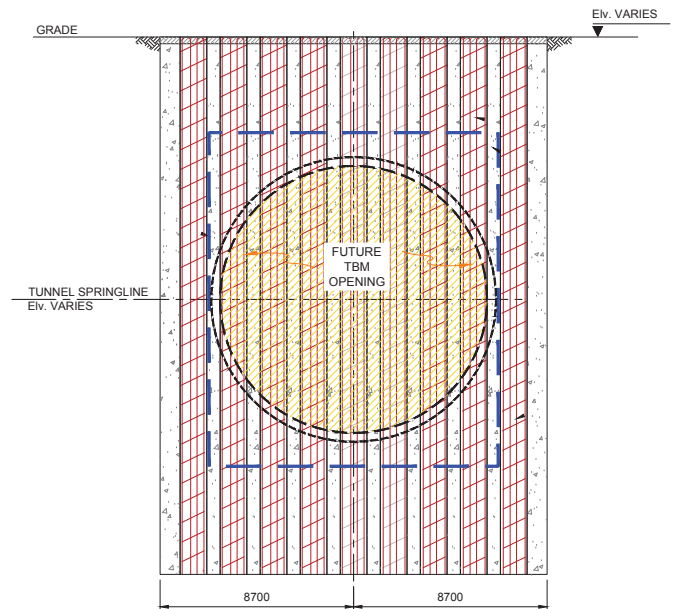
Headwall Cross Section indicating TBM break-in zone with alternate reinforcement.
